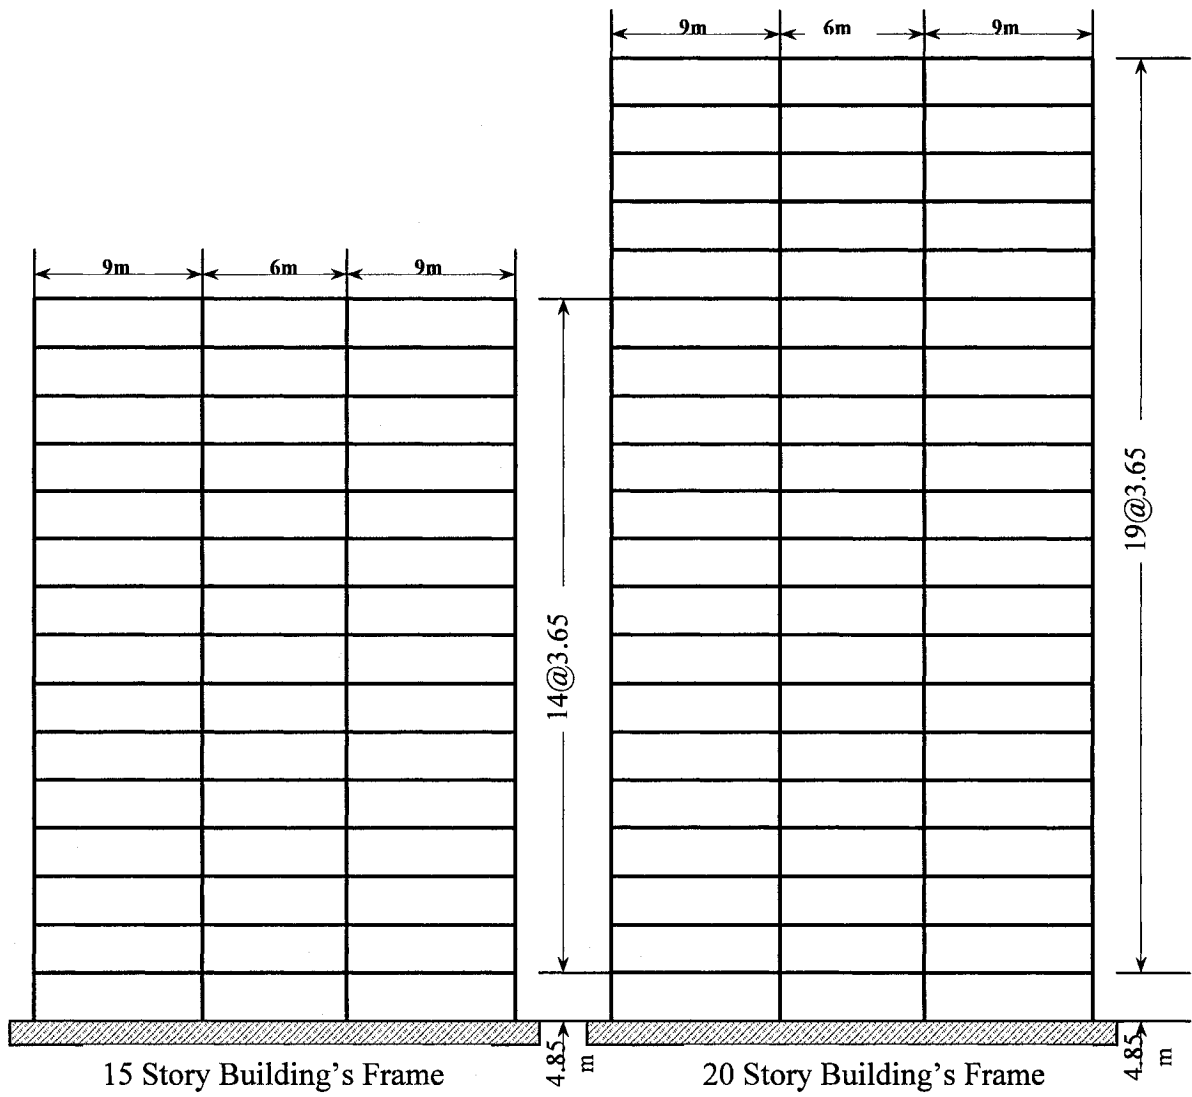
(b): Elevation of 15 & 20 Story Frames.
